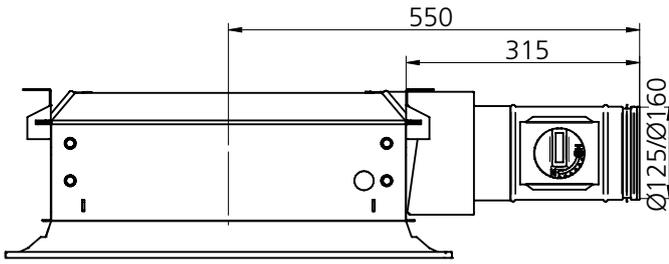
Dimensional drawing, side view. Air connection on the short side - pos 1.
